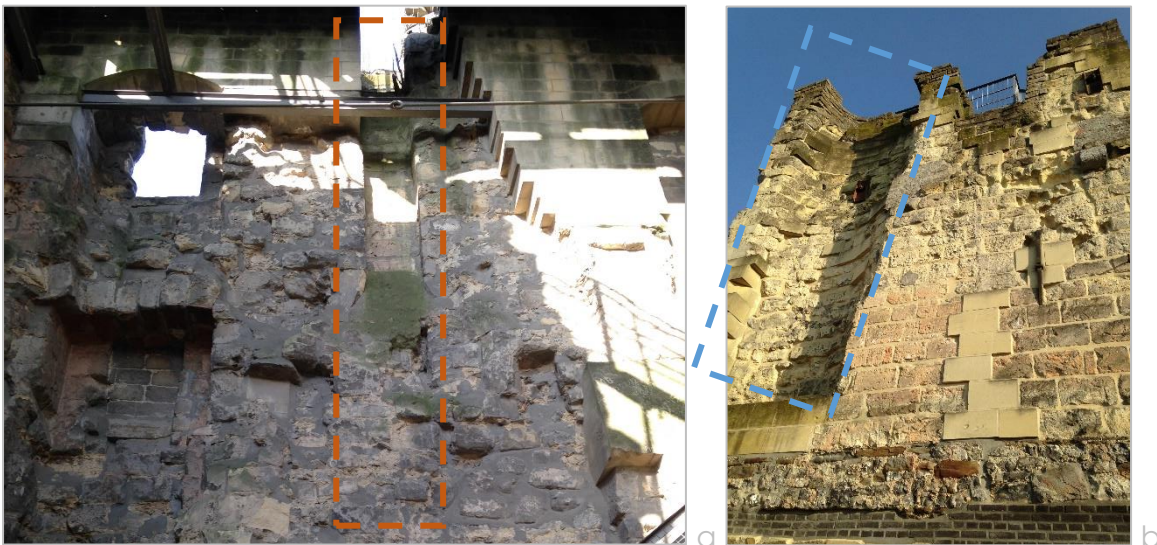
a) Markings inside the ruin of an embedded fireplace flue and b) a cylindrical marking in the west façade. Photographed by author.
